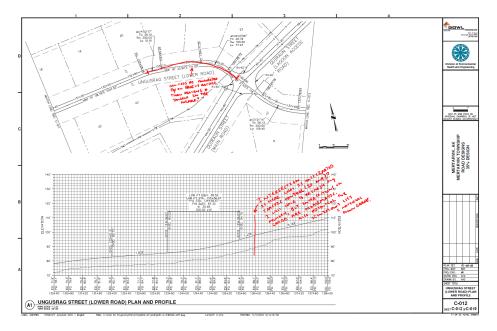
Mertarvik road plan with CSET notes to eliminate short tangent section to avoid lane encroachment.
